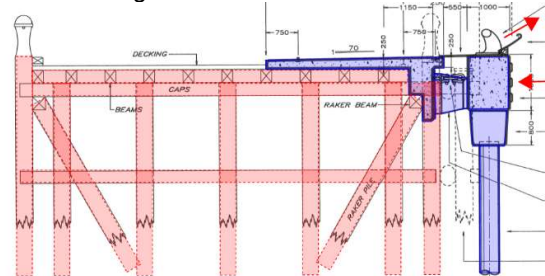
Typical cross section through wharf showing original timber section in red and the 1990's upgrade in blue.
